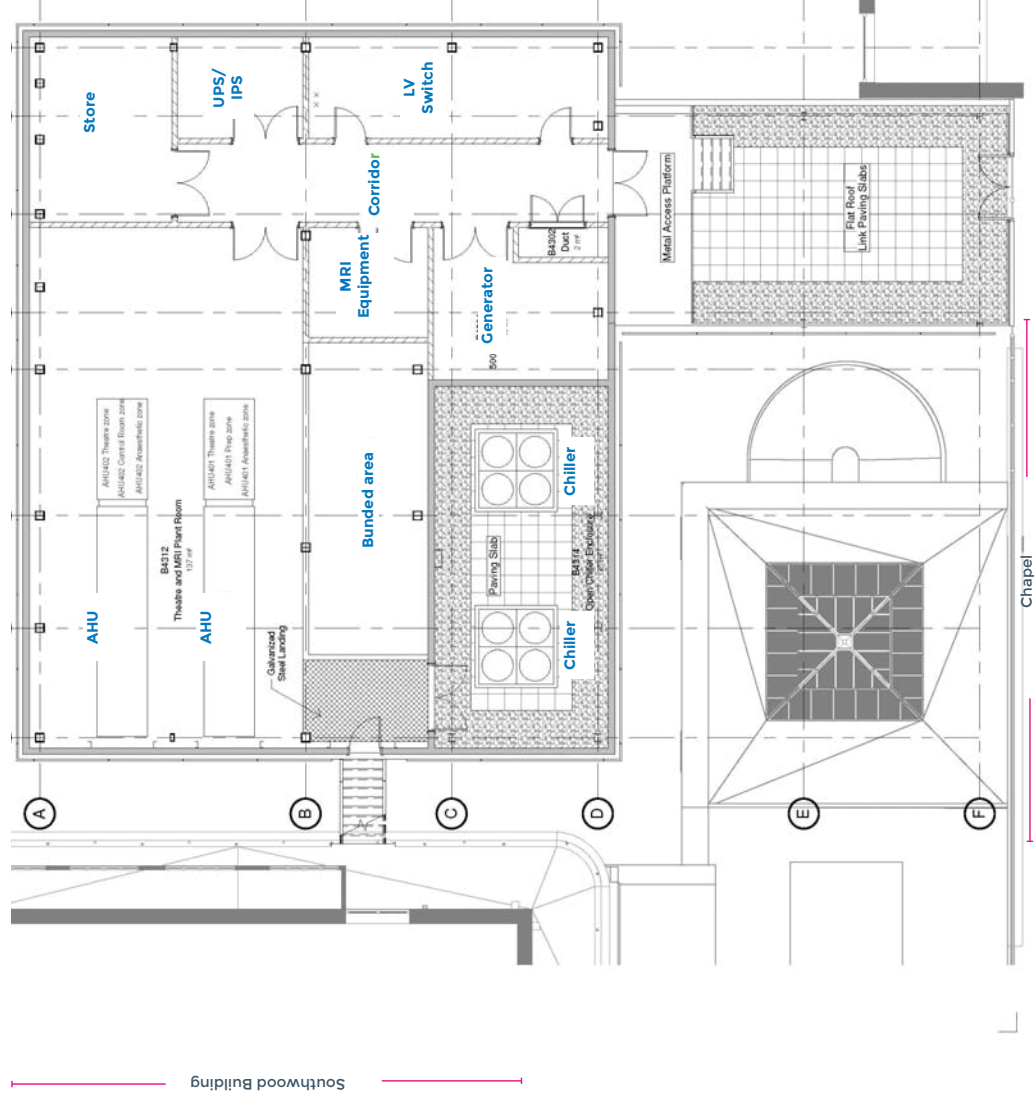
Proposed floor plan at Level 4 (Second Floor)
